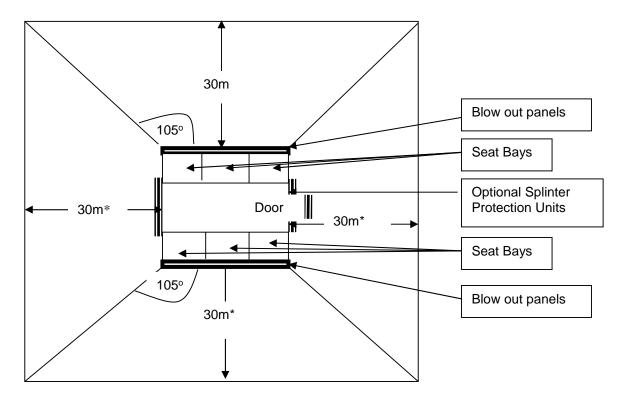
Ejector Seat Storage Building with two rows of Seat Bays
